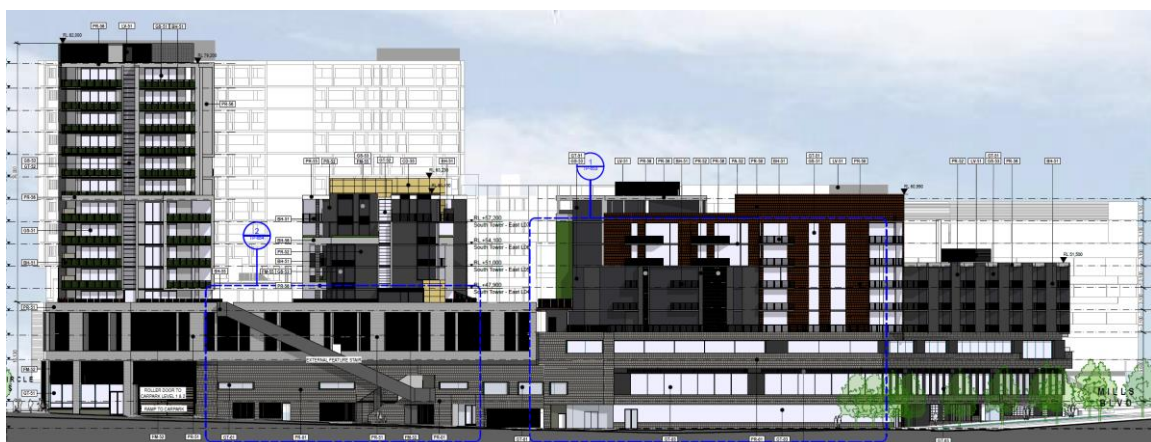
Current amendment Nelmoore Lane (southern) elevation
